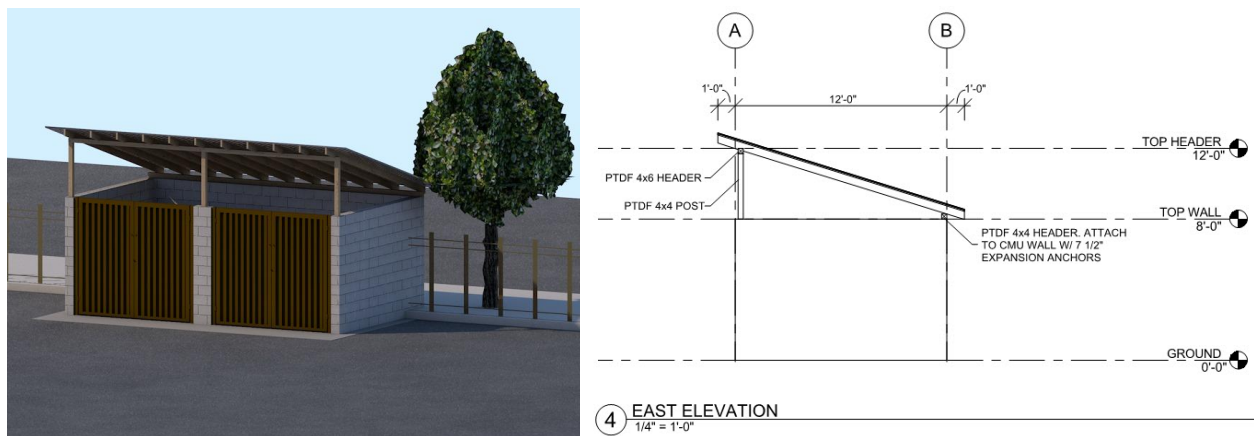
3D rendering of model and elevation created in ARCHICAD.
